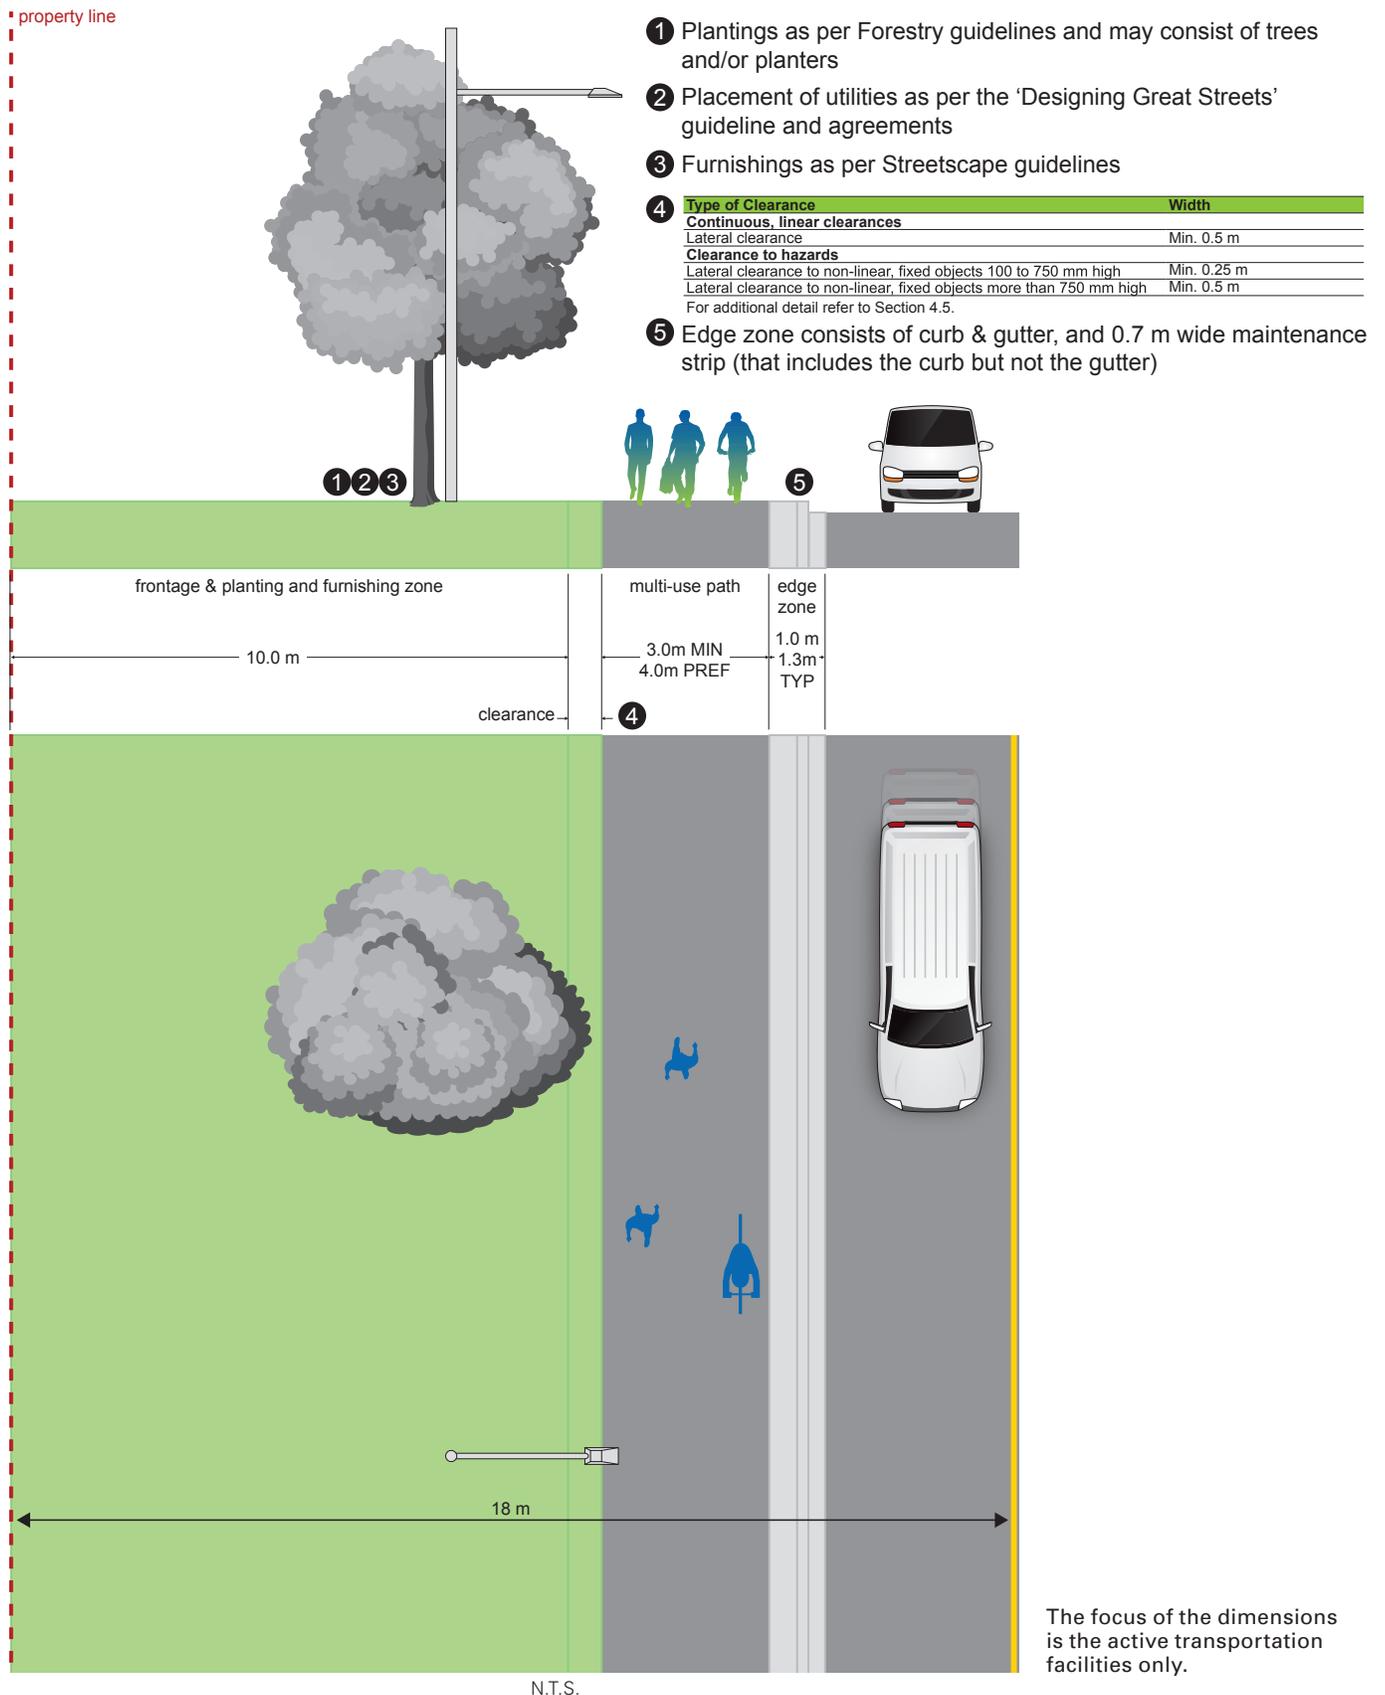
Rural Hamlet Road (36 m ROW)– Multi-use path with two travel lanes (B)
